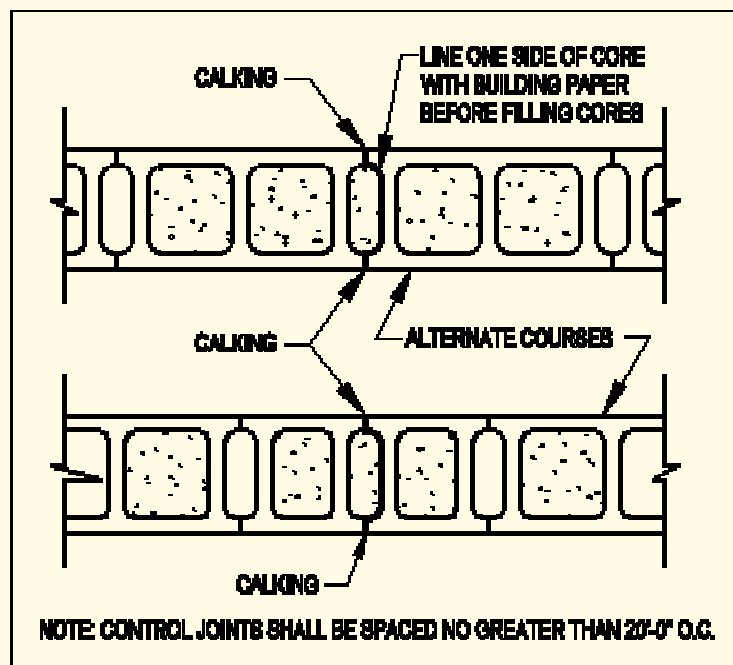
TYPICAL CONTROL JOINT DETAIL
